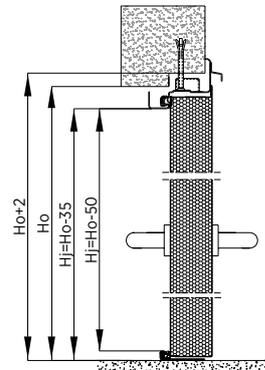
Installation of the double-leaf door with a corner frame without a thermal break to a masonry wall - vertical cross-section
